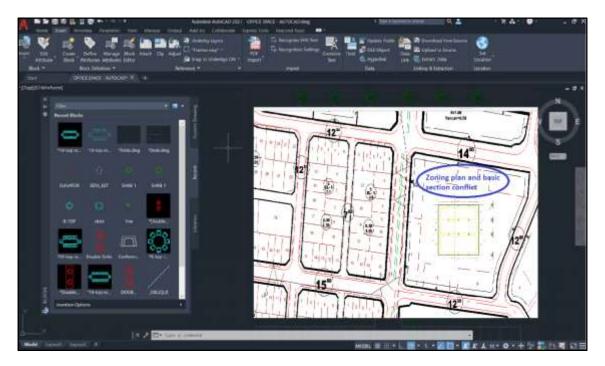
Building ground project and parcel view placed on 3D zoning plan
